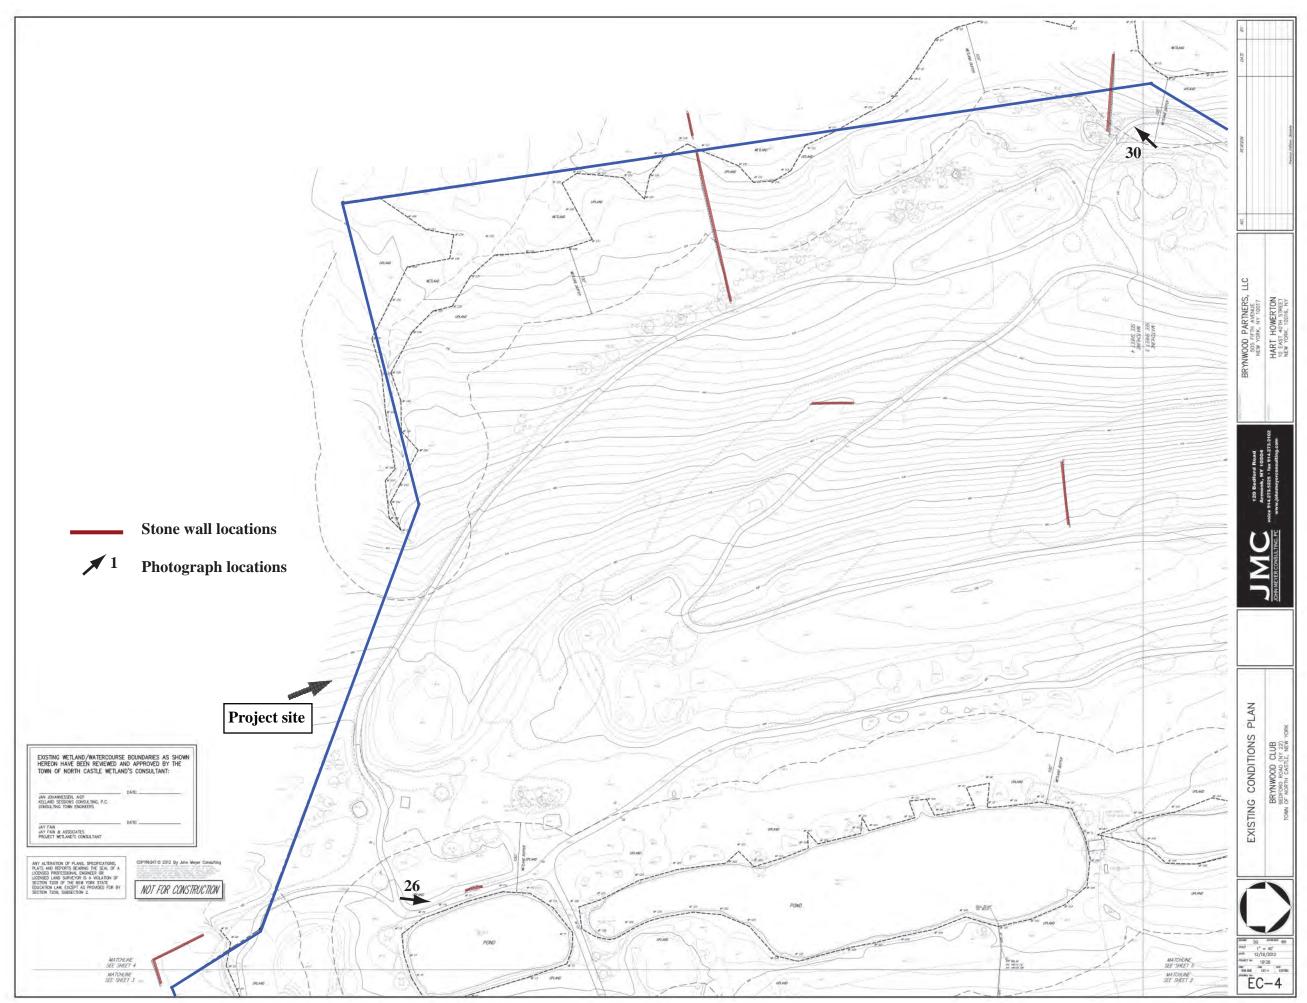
Section of project site topographical survey showing existing conditions, stone walls, and photograph locations (JMC 2012).
